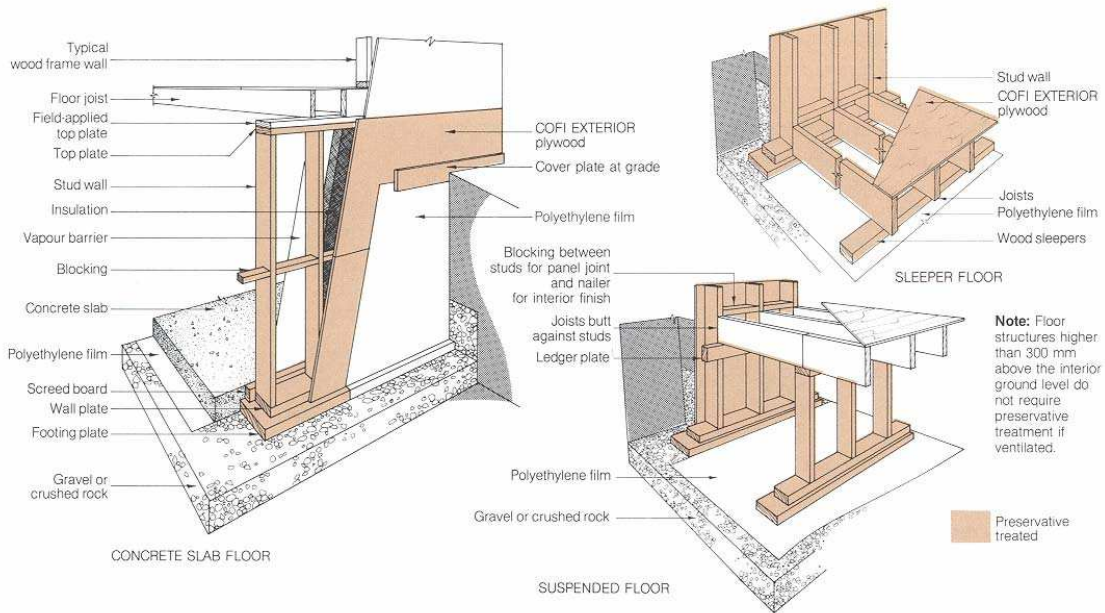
Recommended wall/footing intersection details for permanent wood foundations. [Figure courtesy of Canadian Wood Council.]
